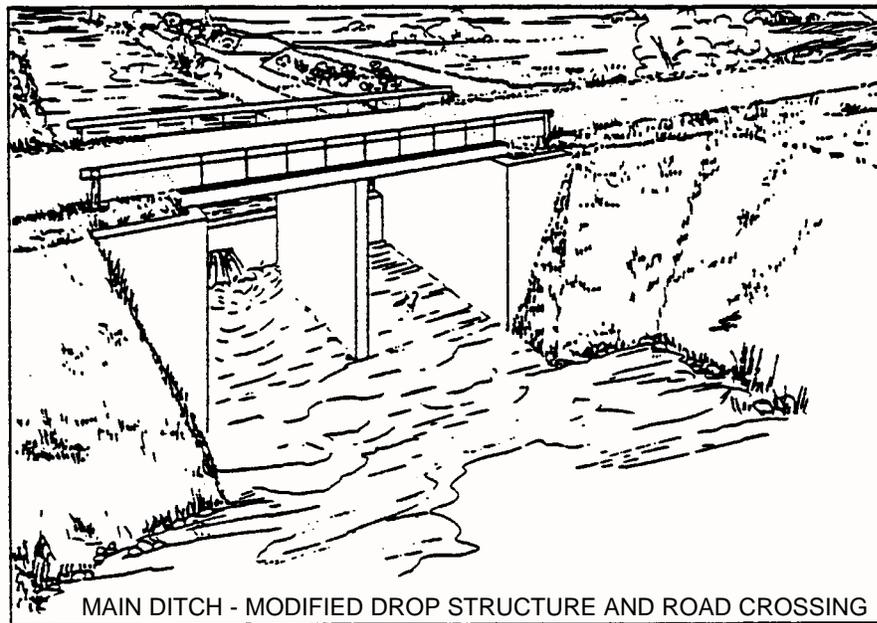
Combination Grade Control Structure and Road Crossing (adapted from U.S. Soil Conservation Service, 1976)
